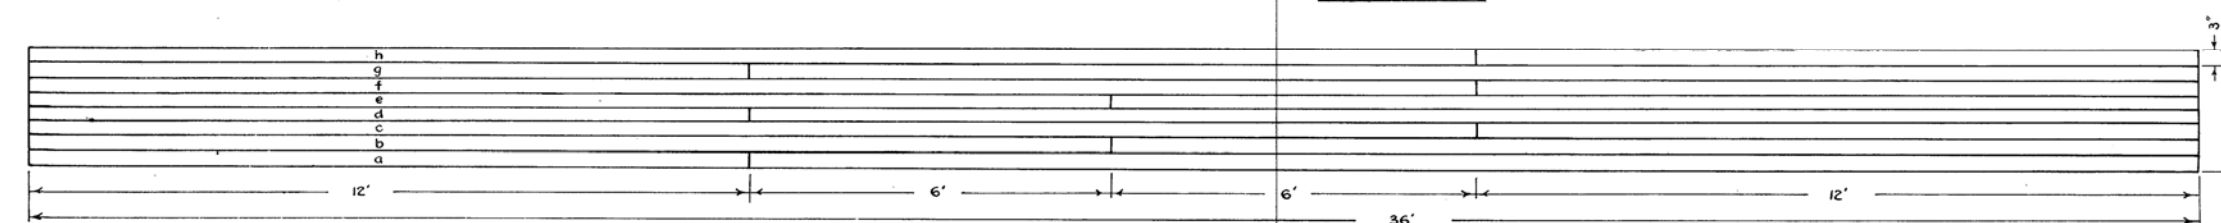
PLAN OF 2' x 36' LAMINATED PANEL
